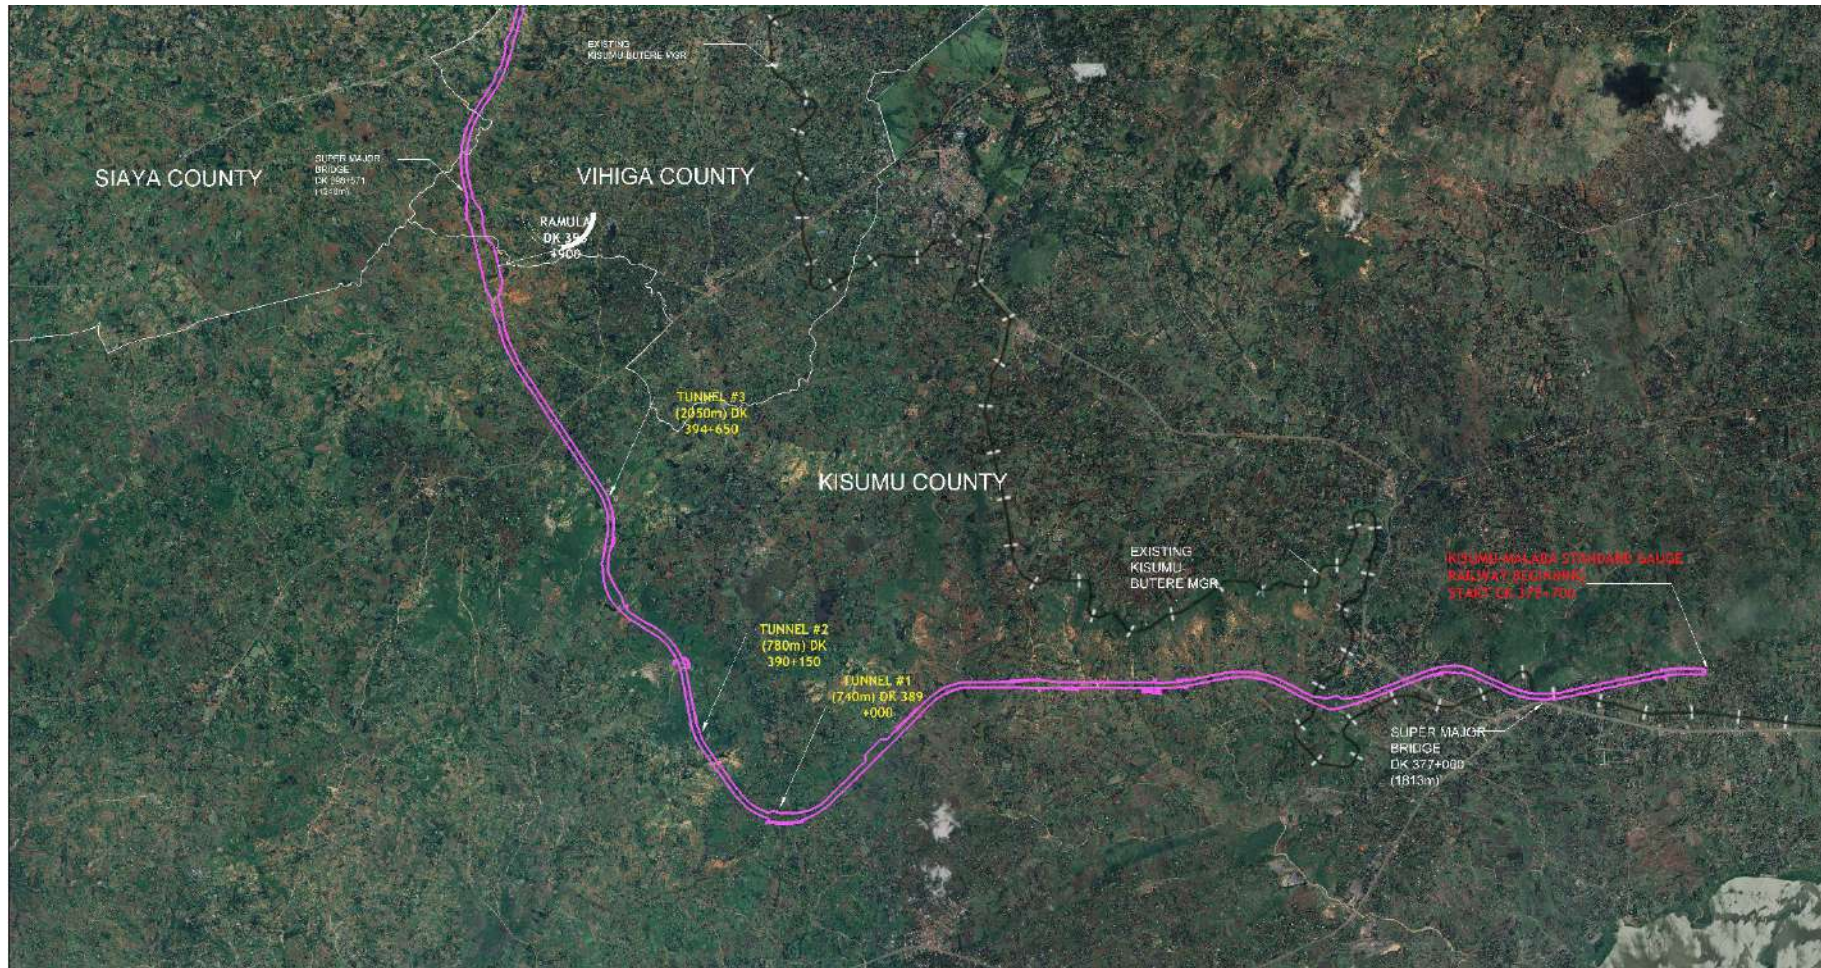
Layout plan SGR Phase 2C Alignment – Kisumu County
